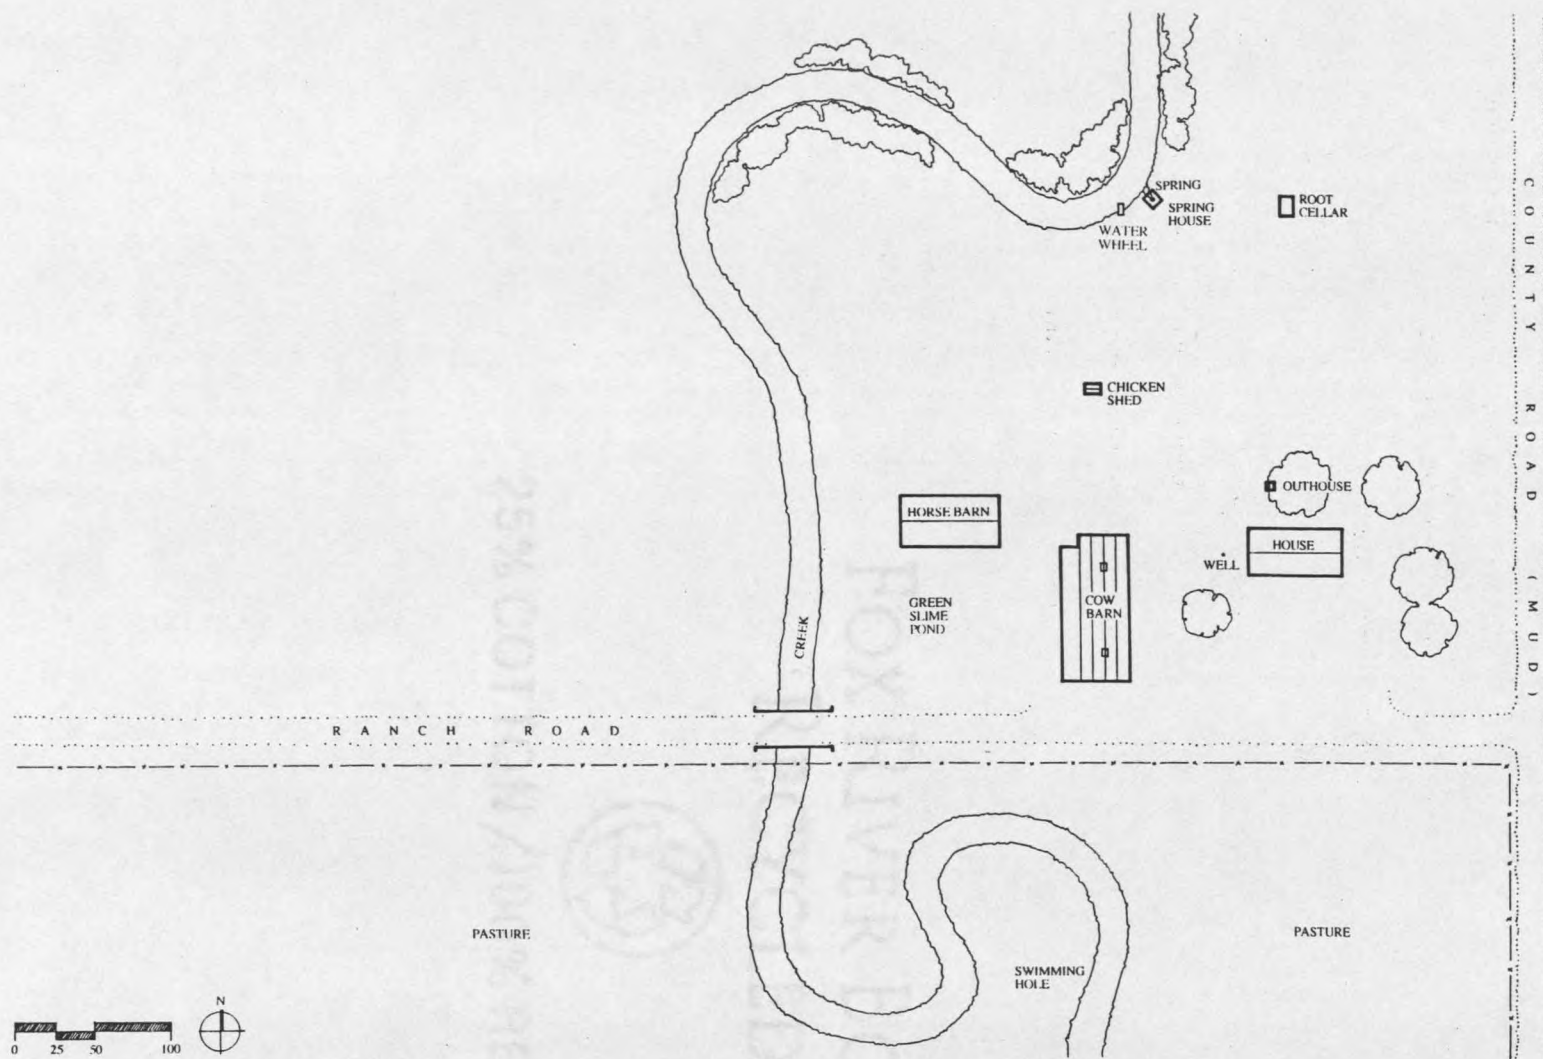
Site #2 - Site plan from 1916 to 1930. Four new domestic and agricultural outbuildings of tertiary scale were constructed, and the cow barn was expanded.
